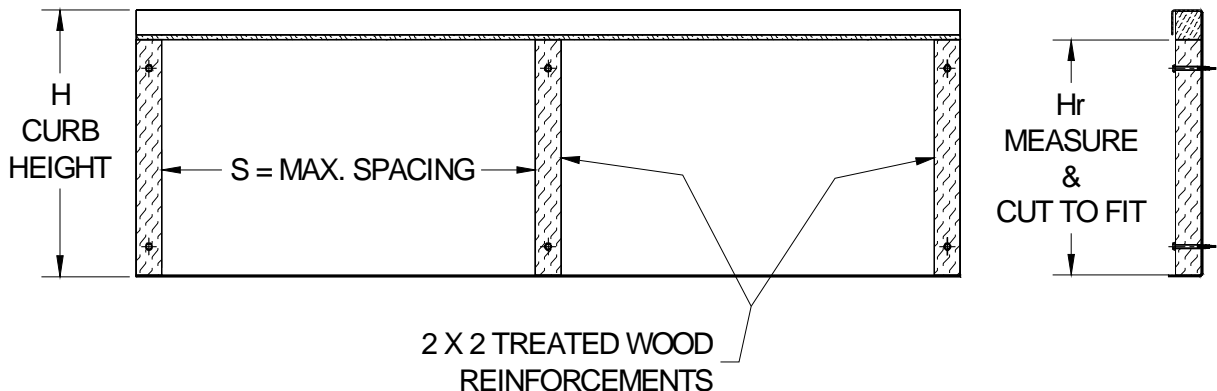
shows the range of curb heights for which the KSVR kit is suitable. Table D6.2.2-1 will show how many vertical reinforcements can be made from one KSVR kit.
